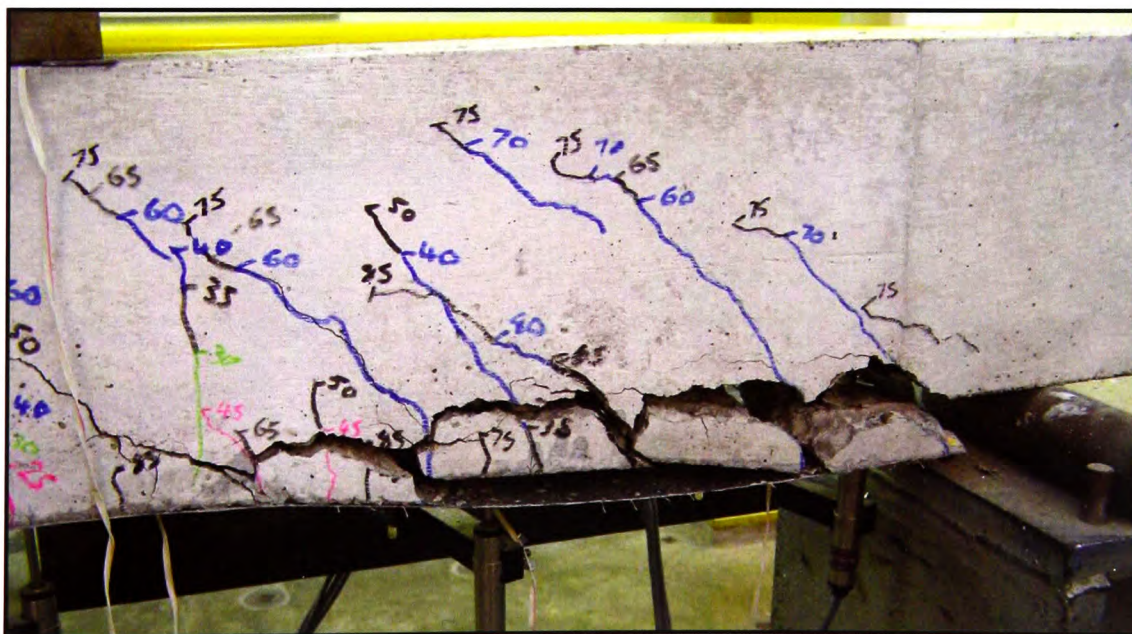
Photograph of typical tearing-off of concrete cover failure
